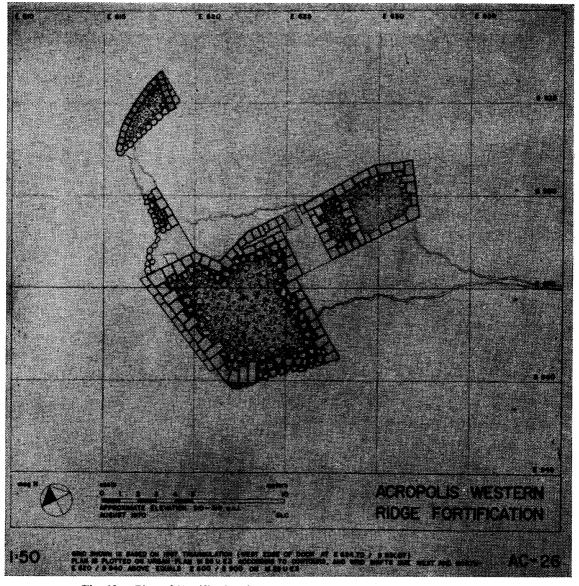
Plan of Fortification ("Hanging Towers") on Western Ridge, Acropolis.
